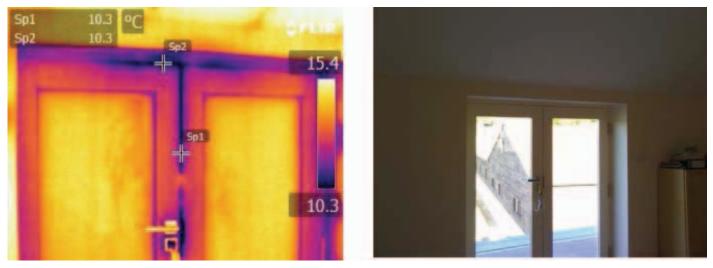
White House Farm, Stirton, Skipton Đingress through opening section of north facing window in first floor bedroom in addition.
